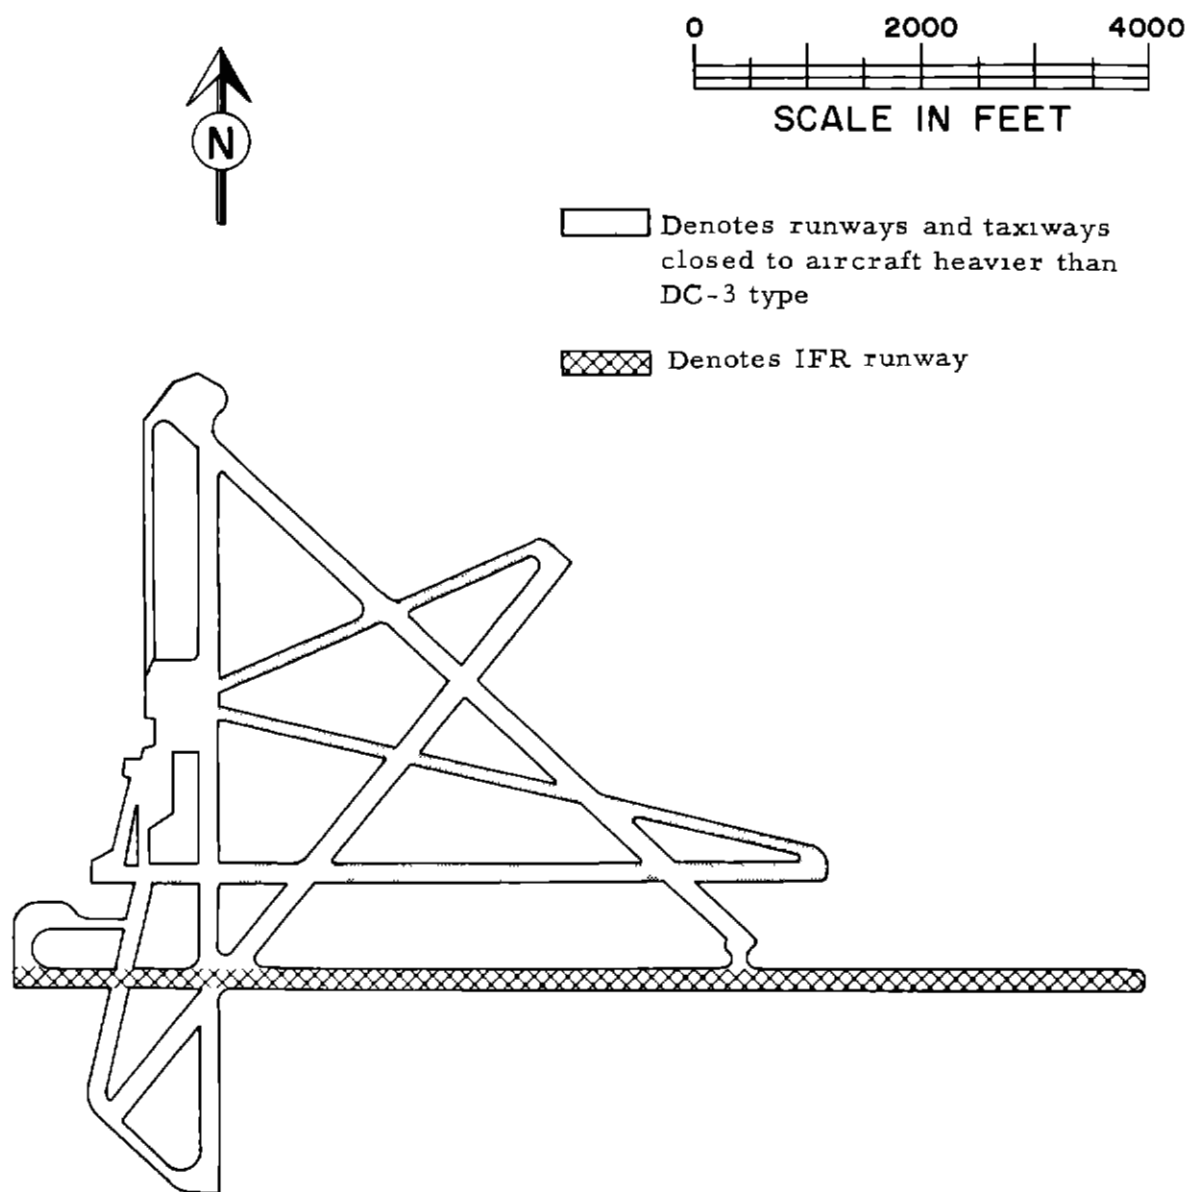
DENVER STAPLETON AIRPORT RUNWAY LAYOUT
